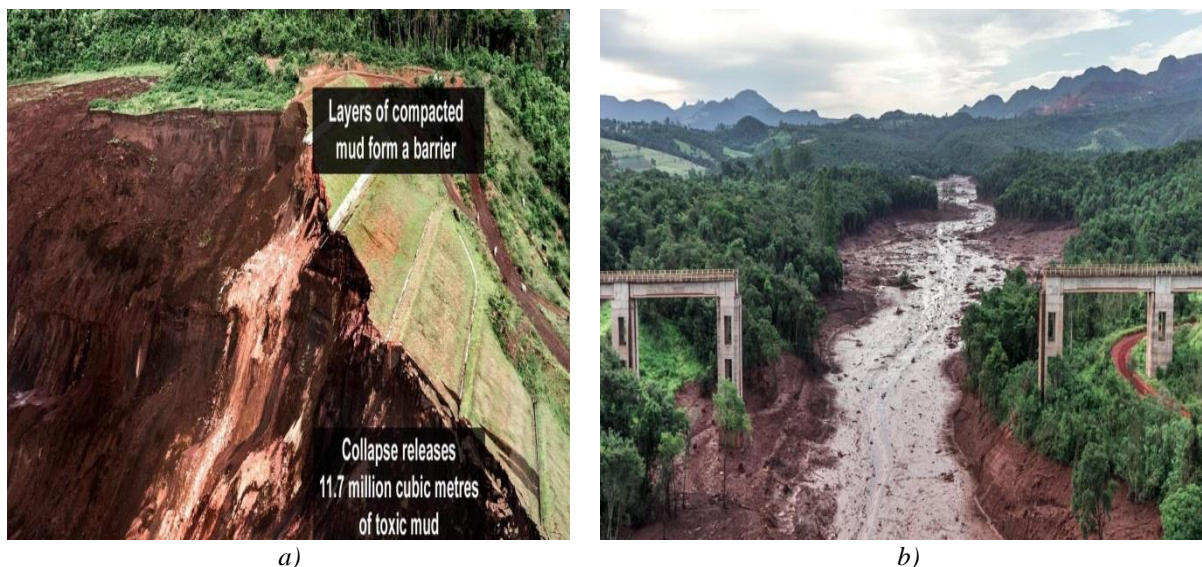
Illustration of mining dam collapse at Vale's Brumadinho mine (a); Tailings pollution material along the river with illustration of the railway bridge collapse, too (b)
